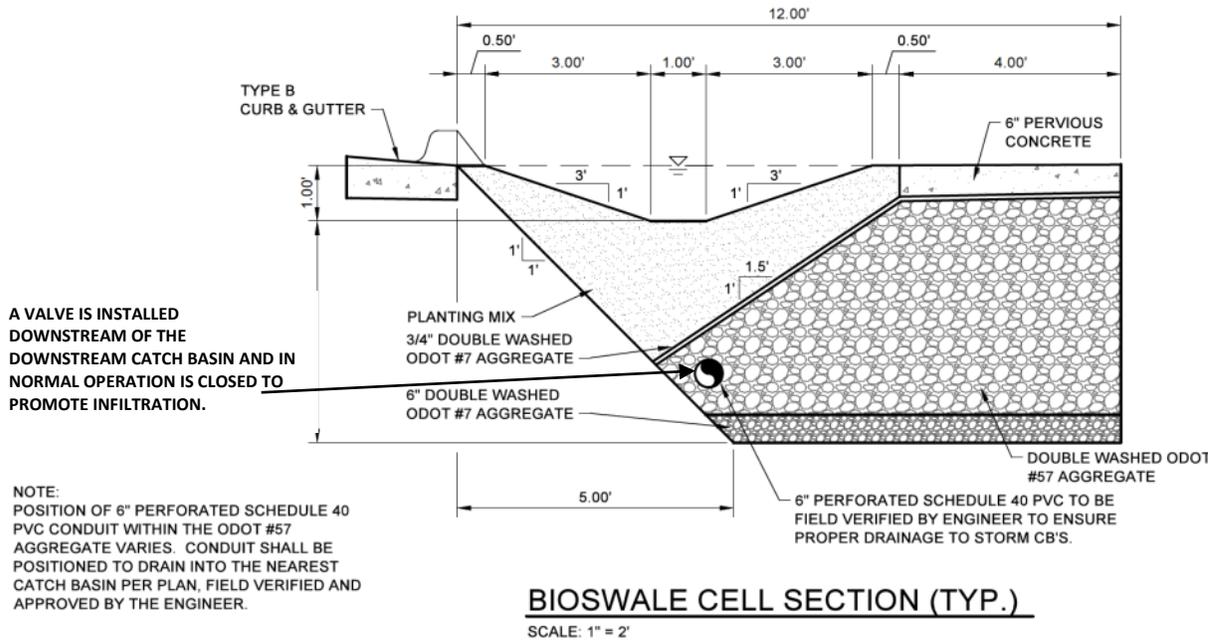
Maywood Avenue Bioswale and Pervious Concrete Section
